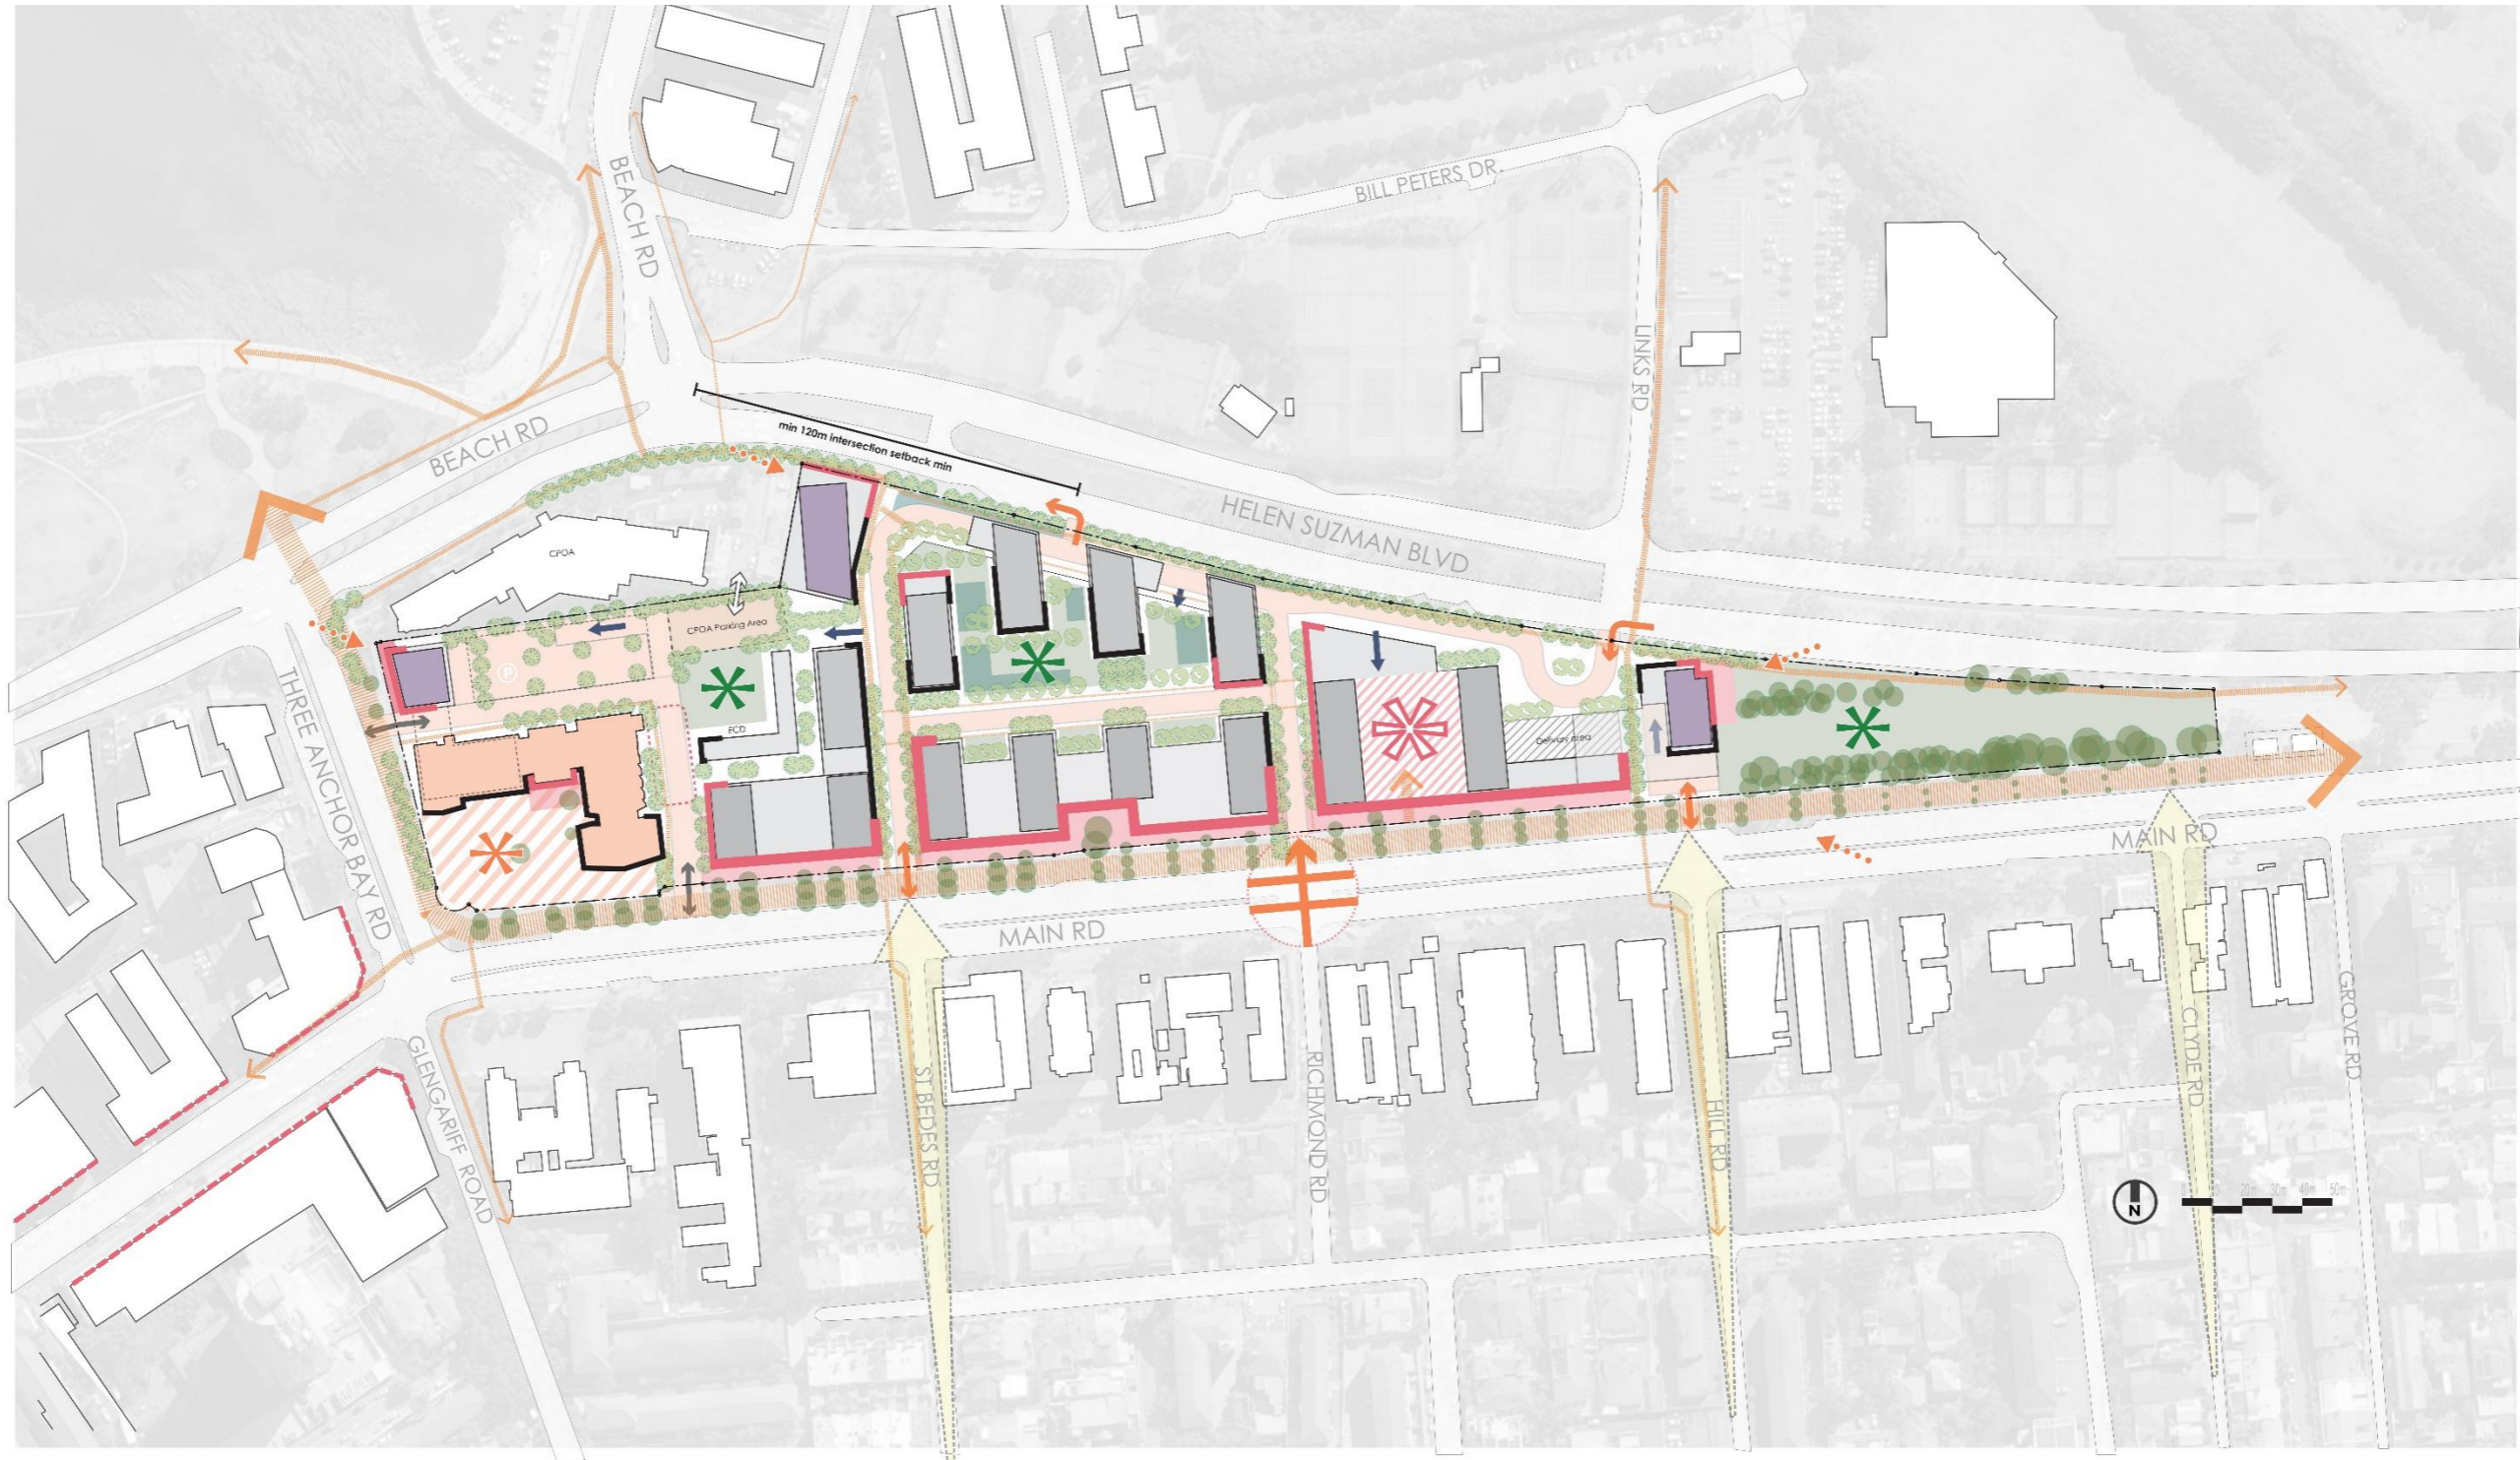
Proposed Overall Conceptual Framework Plan (ACG Architects)
